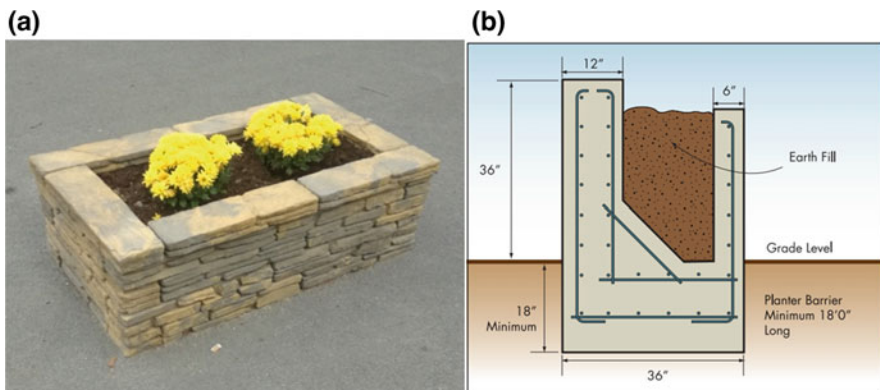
Planters as an anti-blast element (a) ordinary planters (b) engineered planters [9]
